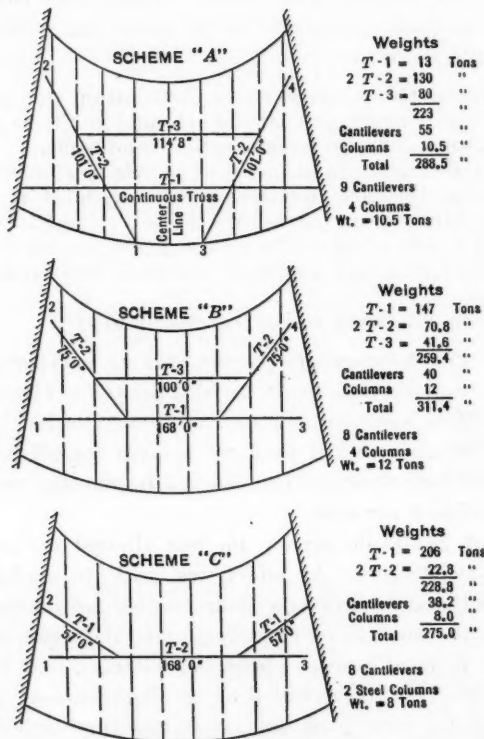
STUDIES FOR STEEL TRUSSES UNDER BALCONY, SHRINE AUDITORIUM.
